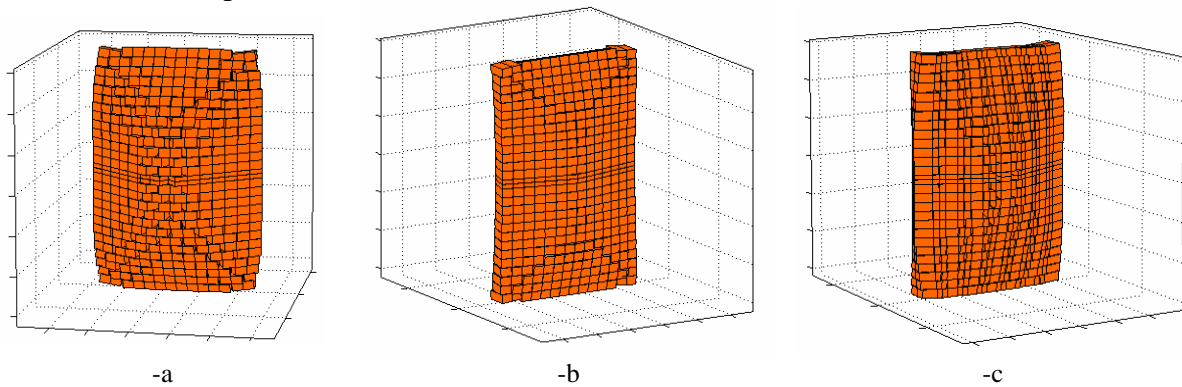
Masonry panel out-of-plane loaded. –a: running bond deformed shape at collapse, thickness  $t$ . –b: running bond deformed shape at collapse, thickness  $2t$ . –c: English bond deformed shape at collapse.
